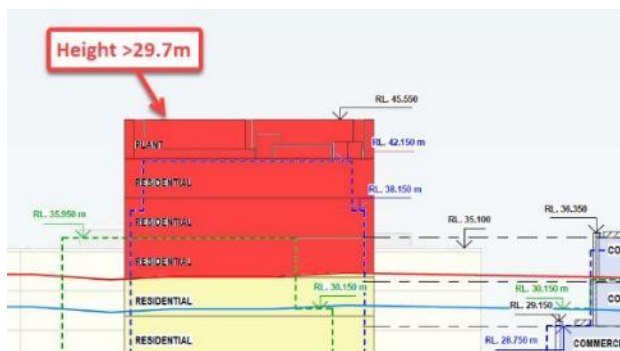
Building C - Courtyard Section Detail: Height >29.7m (Sydney LEP 2012, cl. 6.21D)
